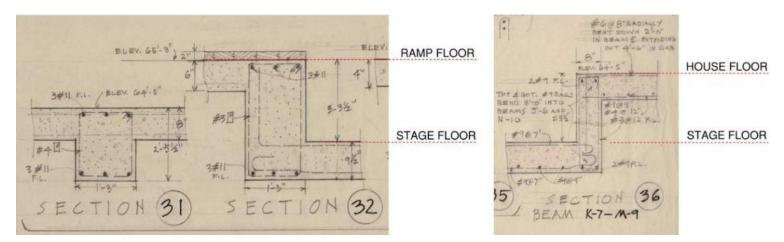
Markup of original plans showing existing structural layout, slab steps and beams. Courtesy of Avery Library.
